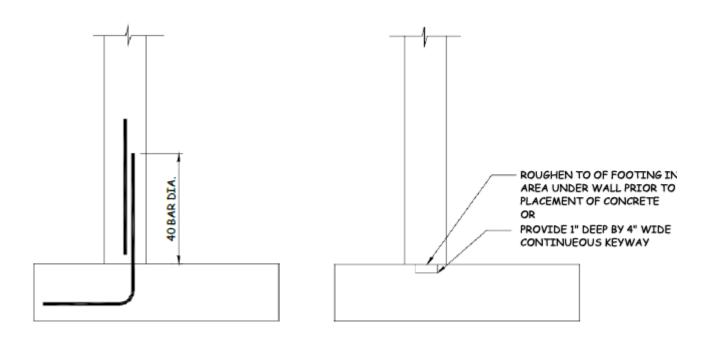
TYPICAL DOWEL AND KEYWAY DETAIL
